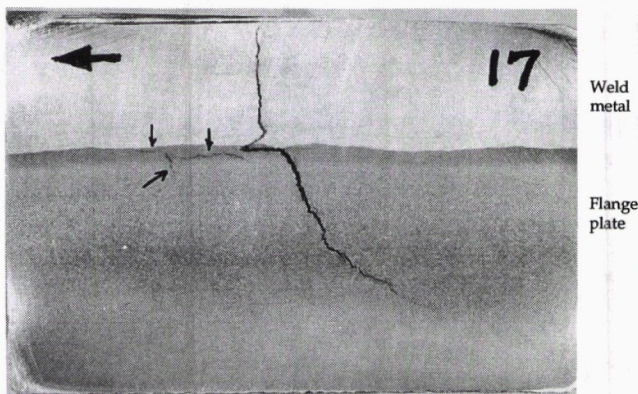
Longitudinal section through Core 17 showing transverse weld metal crack and propagation of crack into flange. Arrows show HAZ crack that propagated into base metal adjacent to primary crack.
